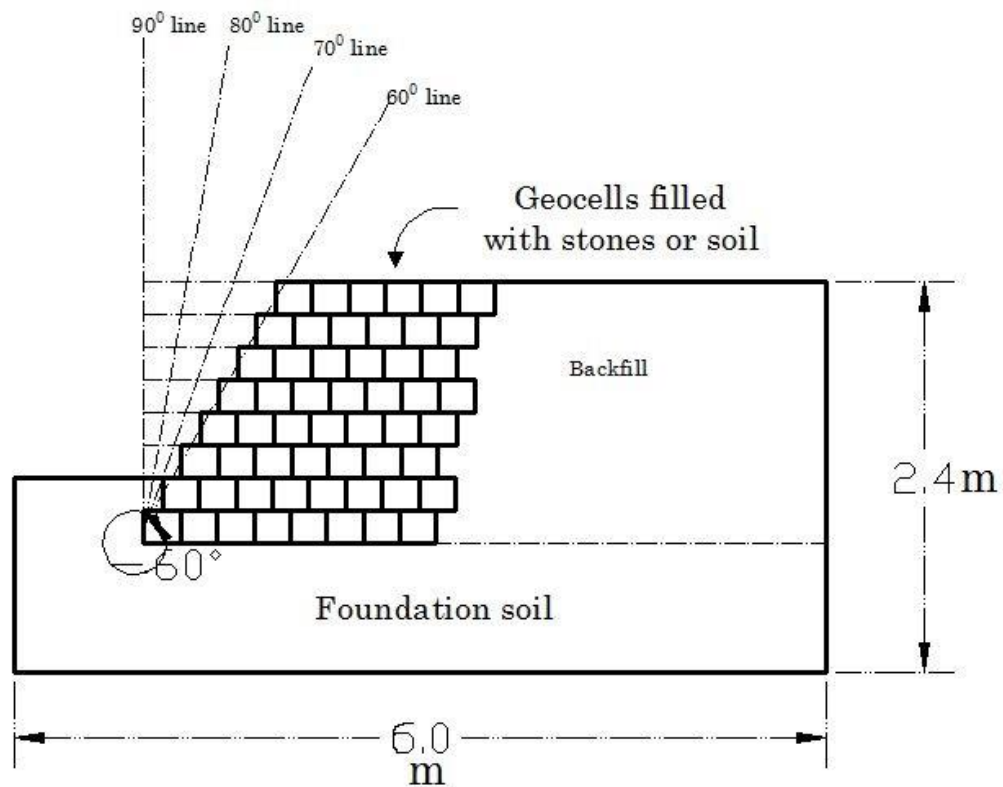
AutoCAD layout of the retaining wall model with different facing angles in a 2D view indicating geocells and soil
